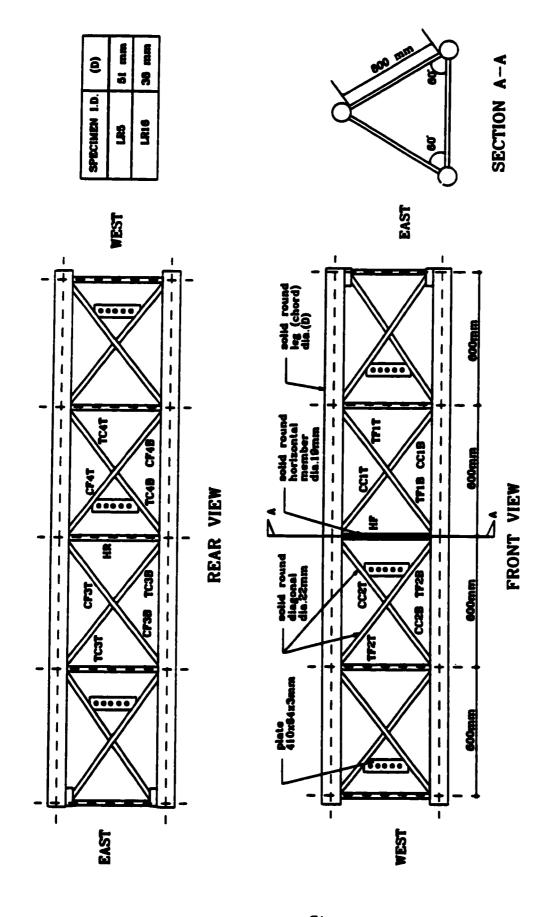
Dimensions of Specimens LR5 and LR16
